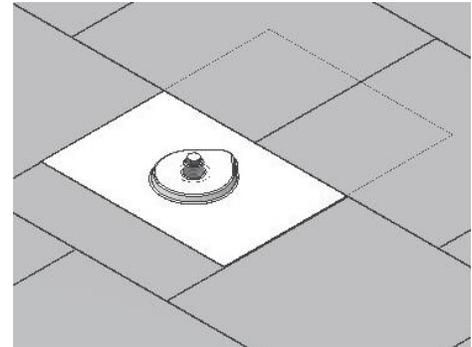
Slide the roof flashing into place under the overlapping shingle and over the threaded portion of the roof shoe
